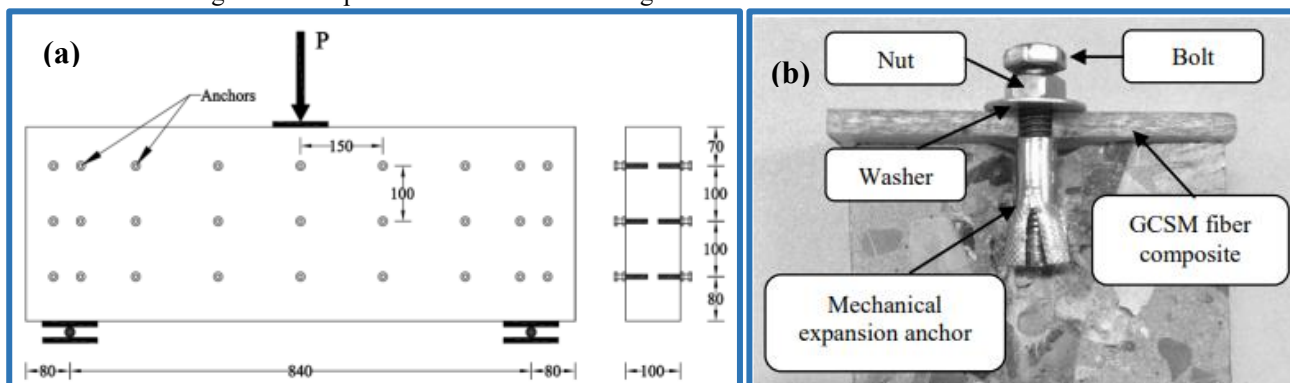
System and Locations of the Mechanical Anchors a) Typical Location of Mechanical Anchors (all units in mm) b) System of Mechanical Anchor [20]
